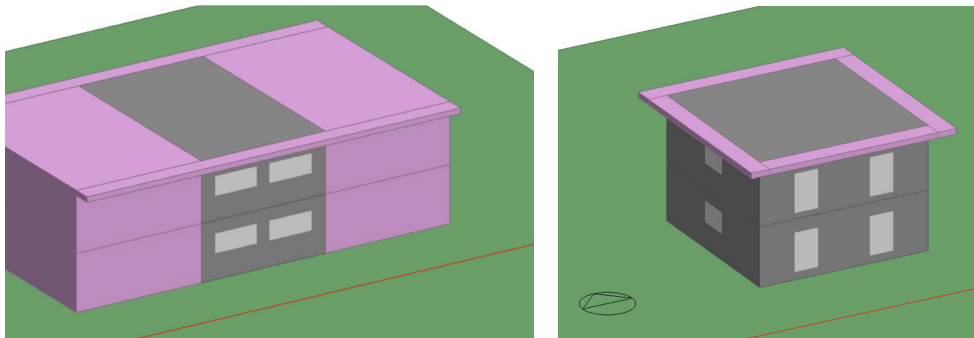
Roof overhangs of 1m in S-N attached house (left side) and detached house (right side).
